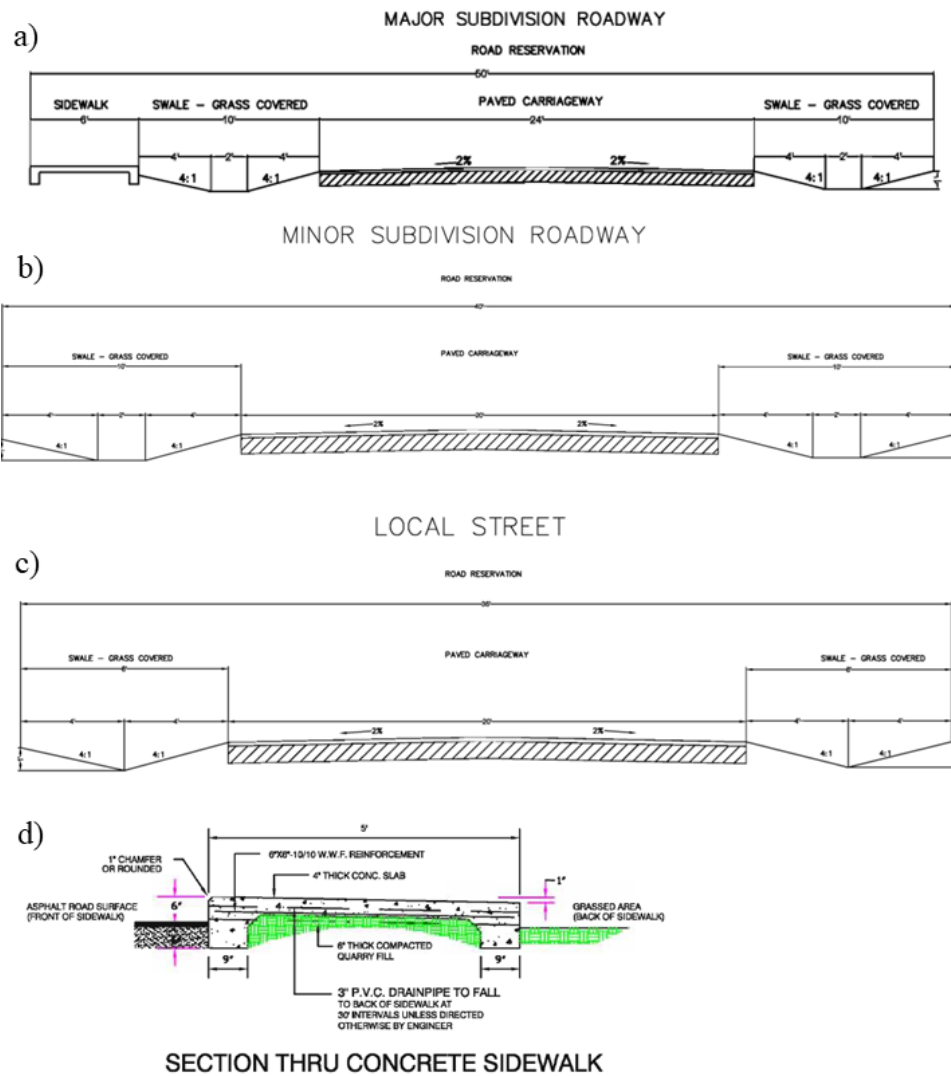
Typical Right-of-Way configurations: cross-sections for roads in The Bahamas. 1a) corresponds to Major subdivision roadways with 24' paved carriageway and one sidewalk. 1b) corresponds to Minor subdivision roadways with 20' paved carriageway and no sidewalk. 1c) corresponds to Local Street roadways with 20' paved carriageway and no sidewalk. 1d) indicates section thru concrete sidewalk. Source: Government of The Bahamas, (2004, pp. 28, 29, 42)
